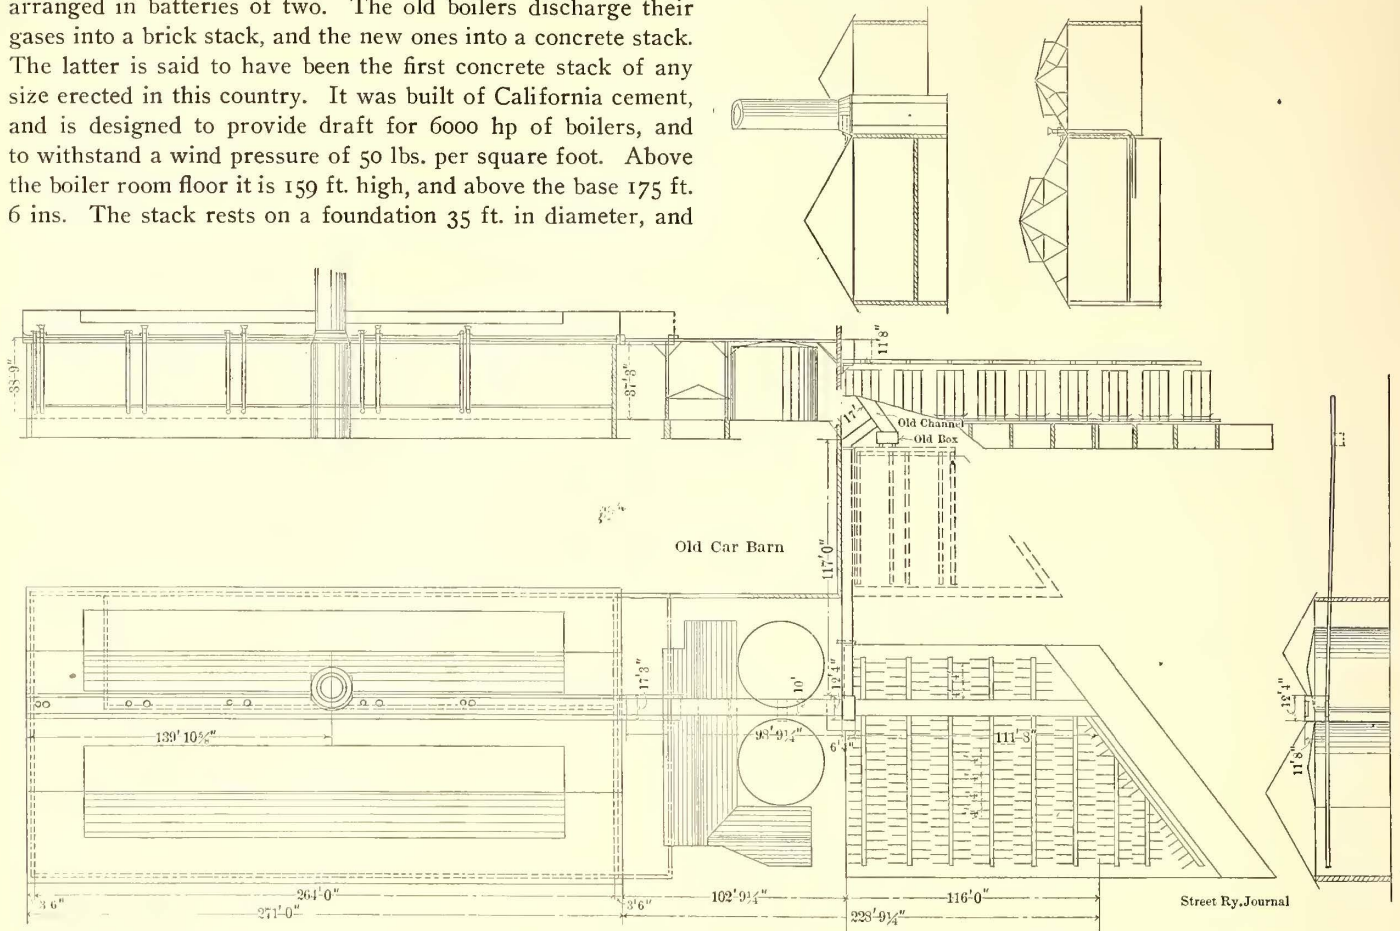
PLAN AND SECTION SHOWING GENERAL ARRANGEMENT OF WATER-COOLING SYSTEM
